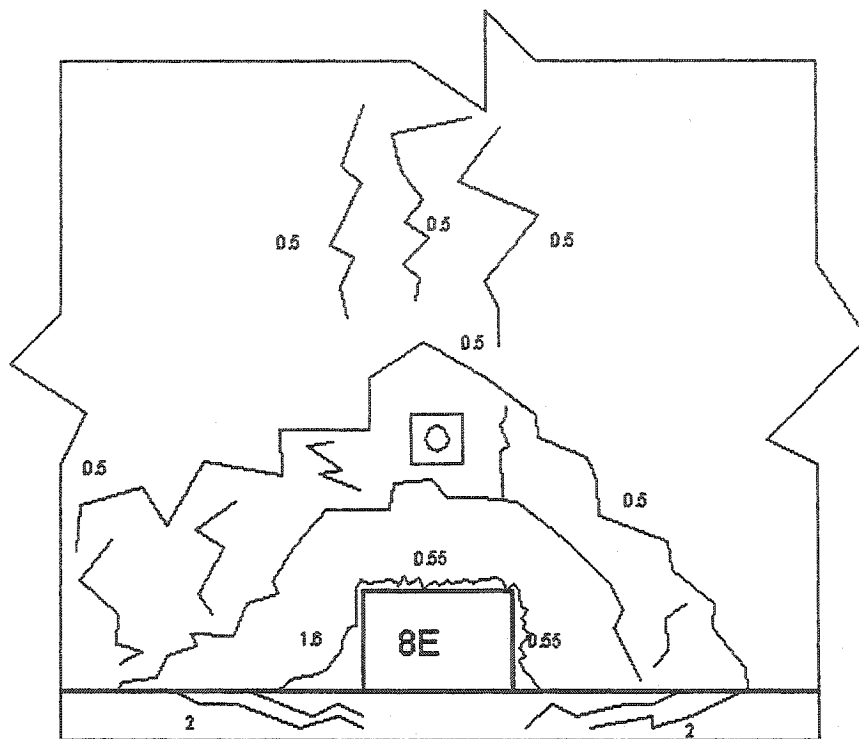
Crack pattern of column 8E connection, all the size of the cracks are in mm
